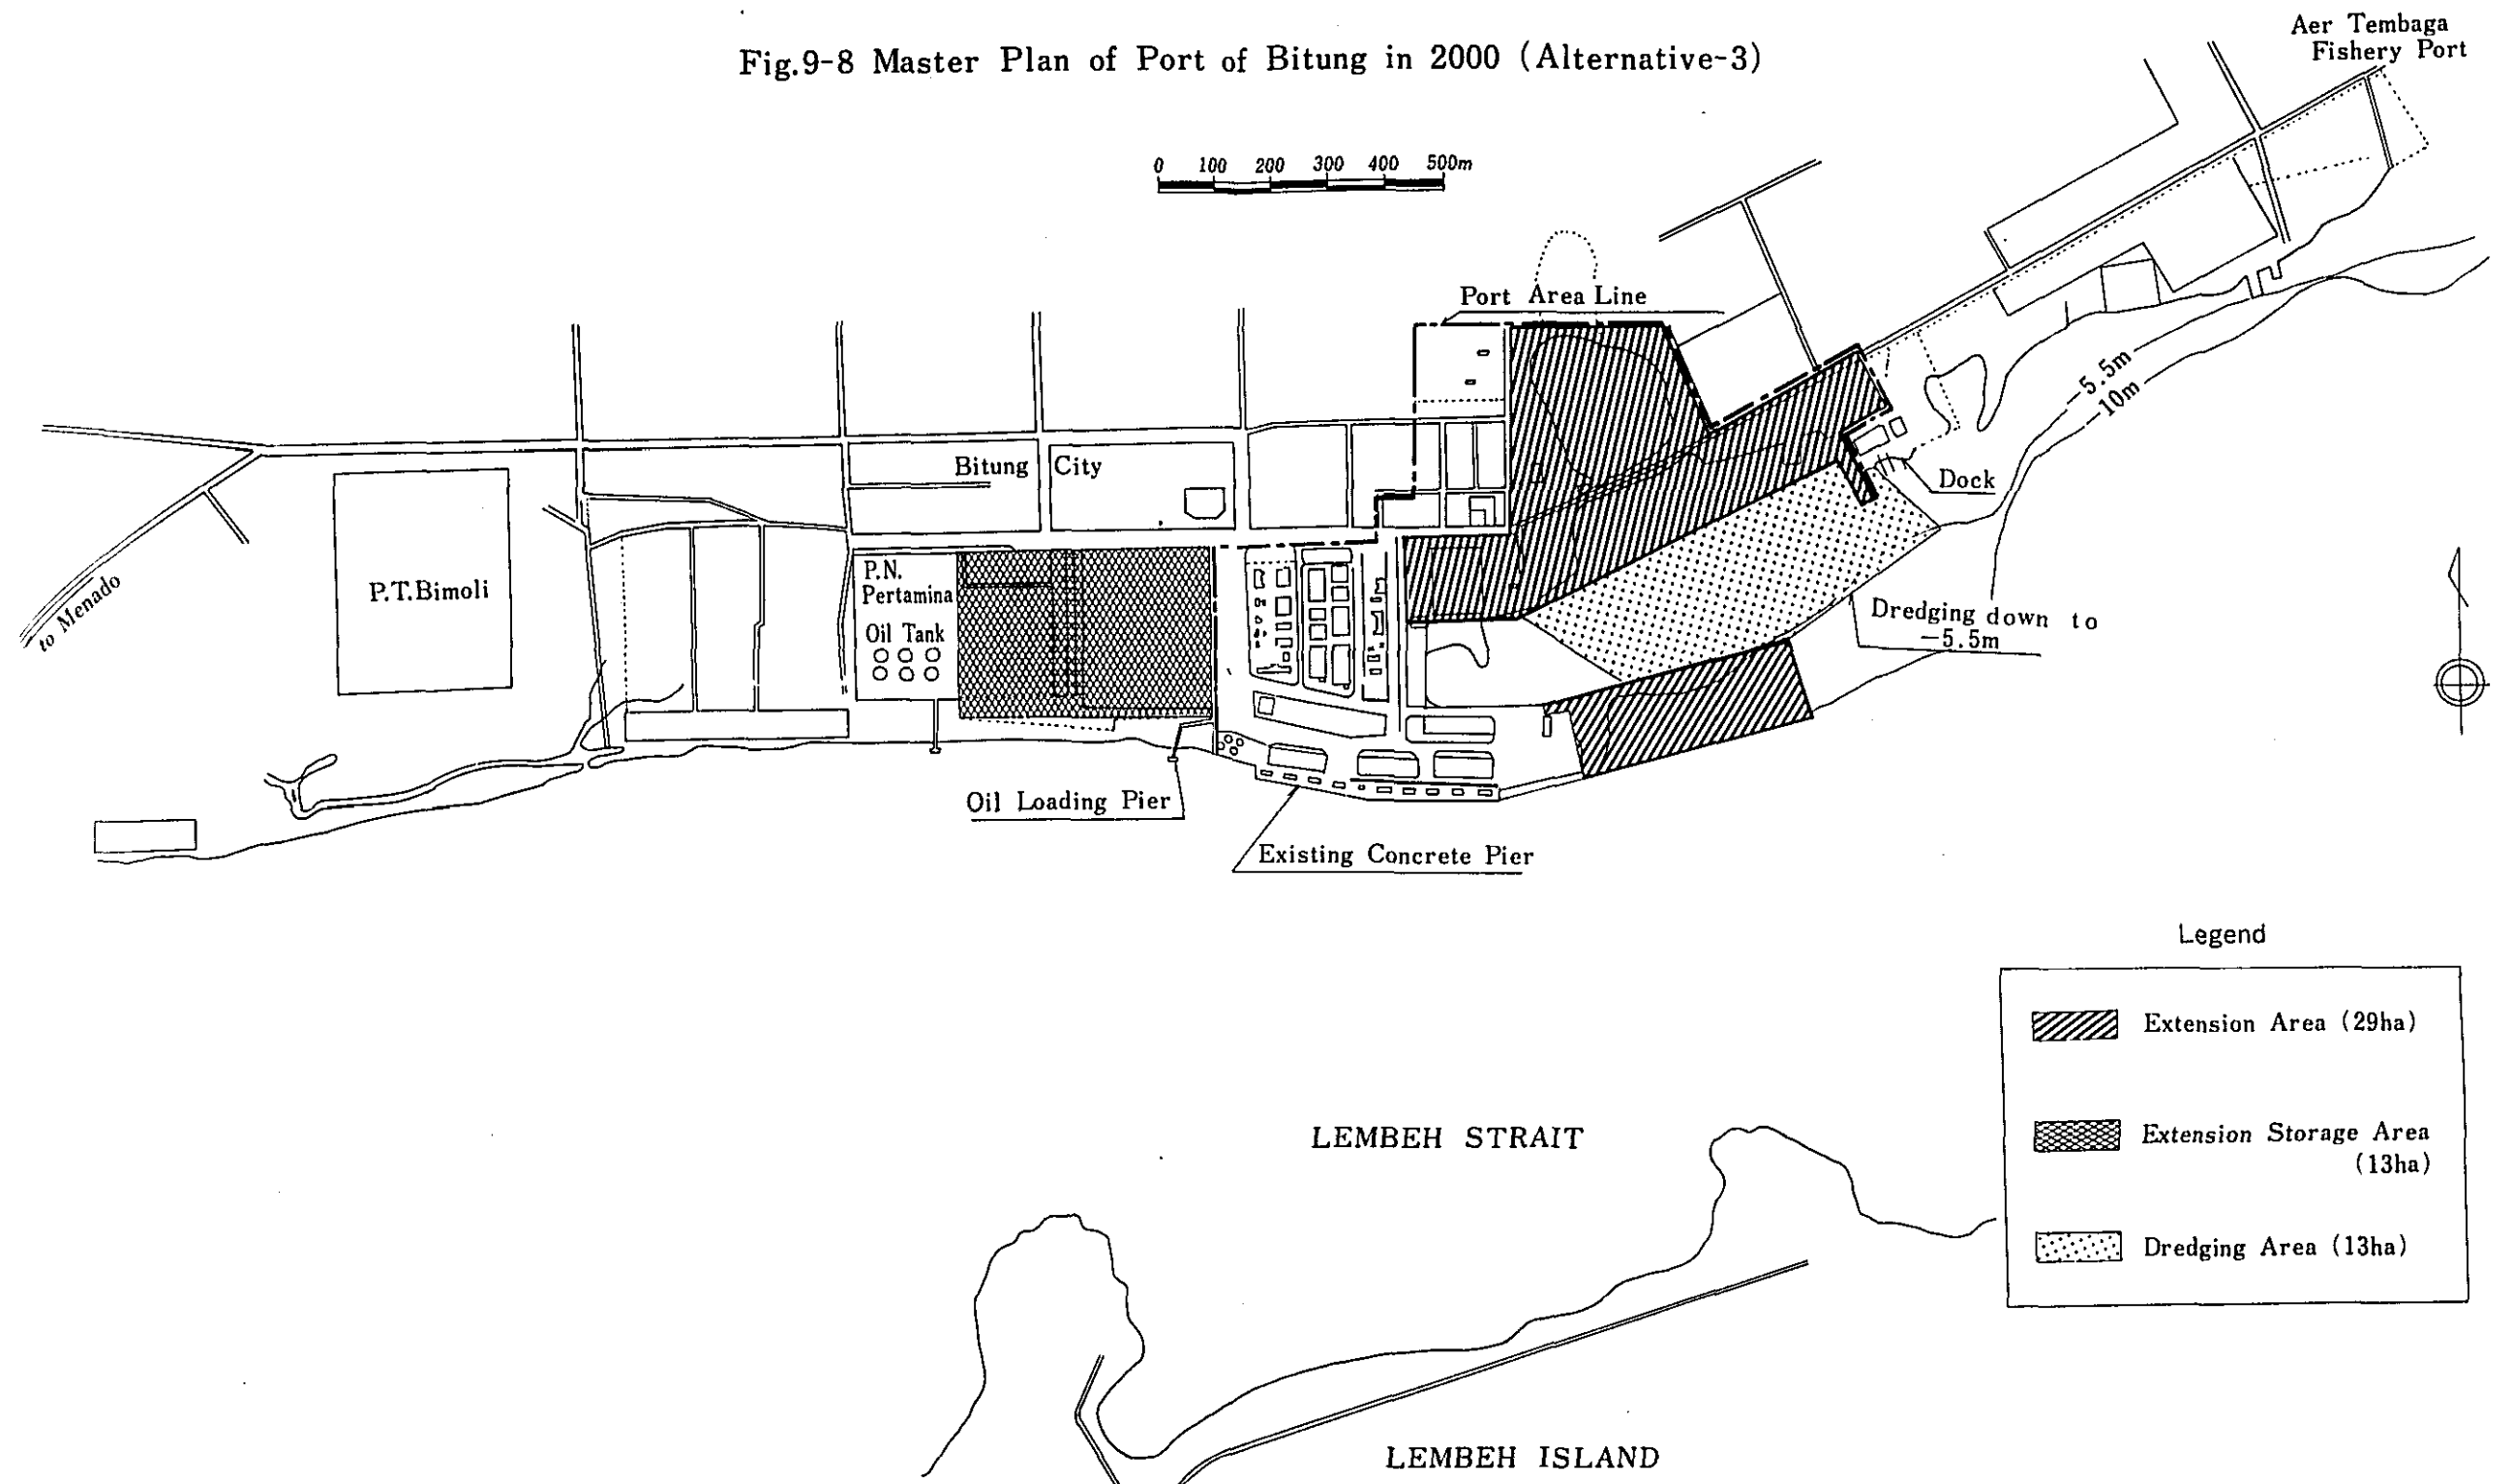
Master Plan of Port of Bitung in 2000 (Alternative-3)
